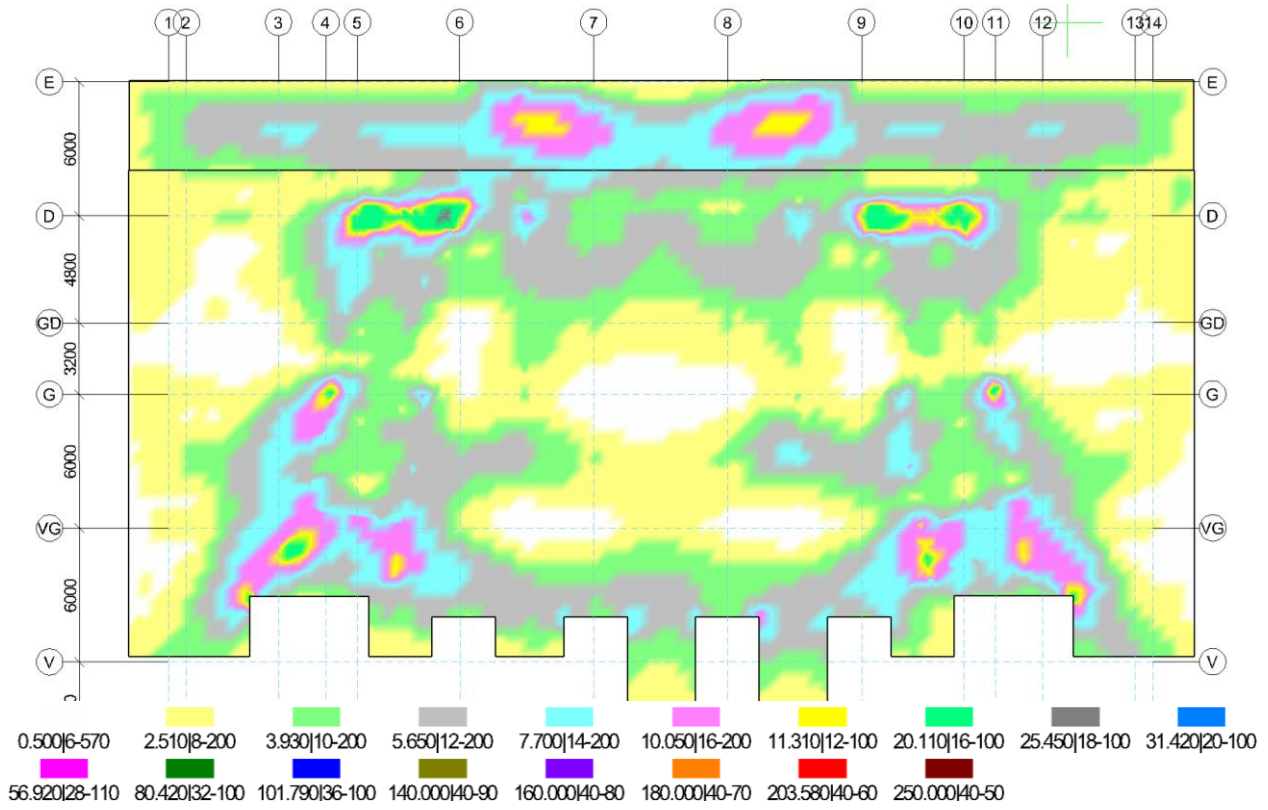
Reinforcement of the foundation. Lower longitudinal reinforcement in the direction of the axis R, cm^2/m [14]
